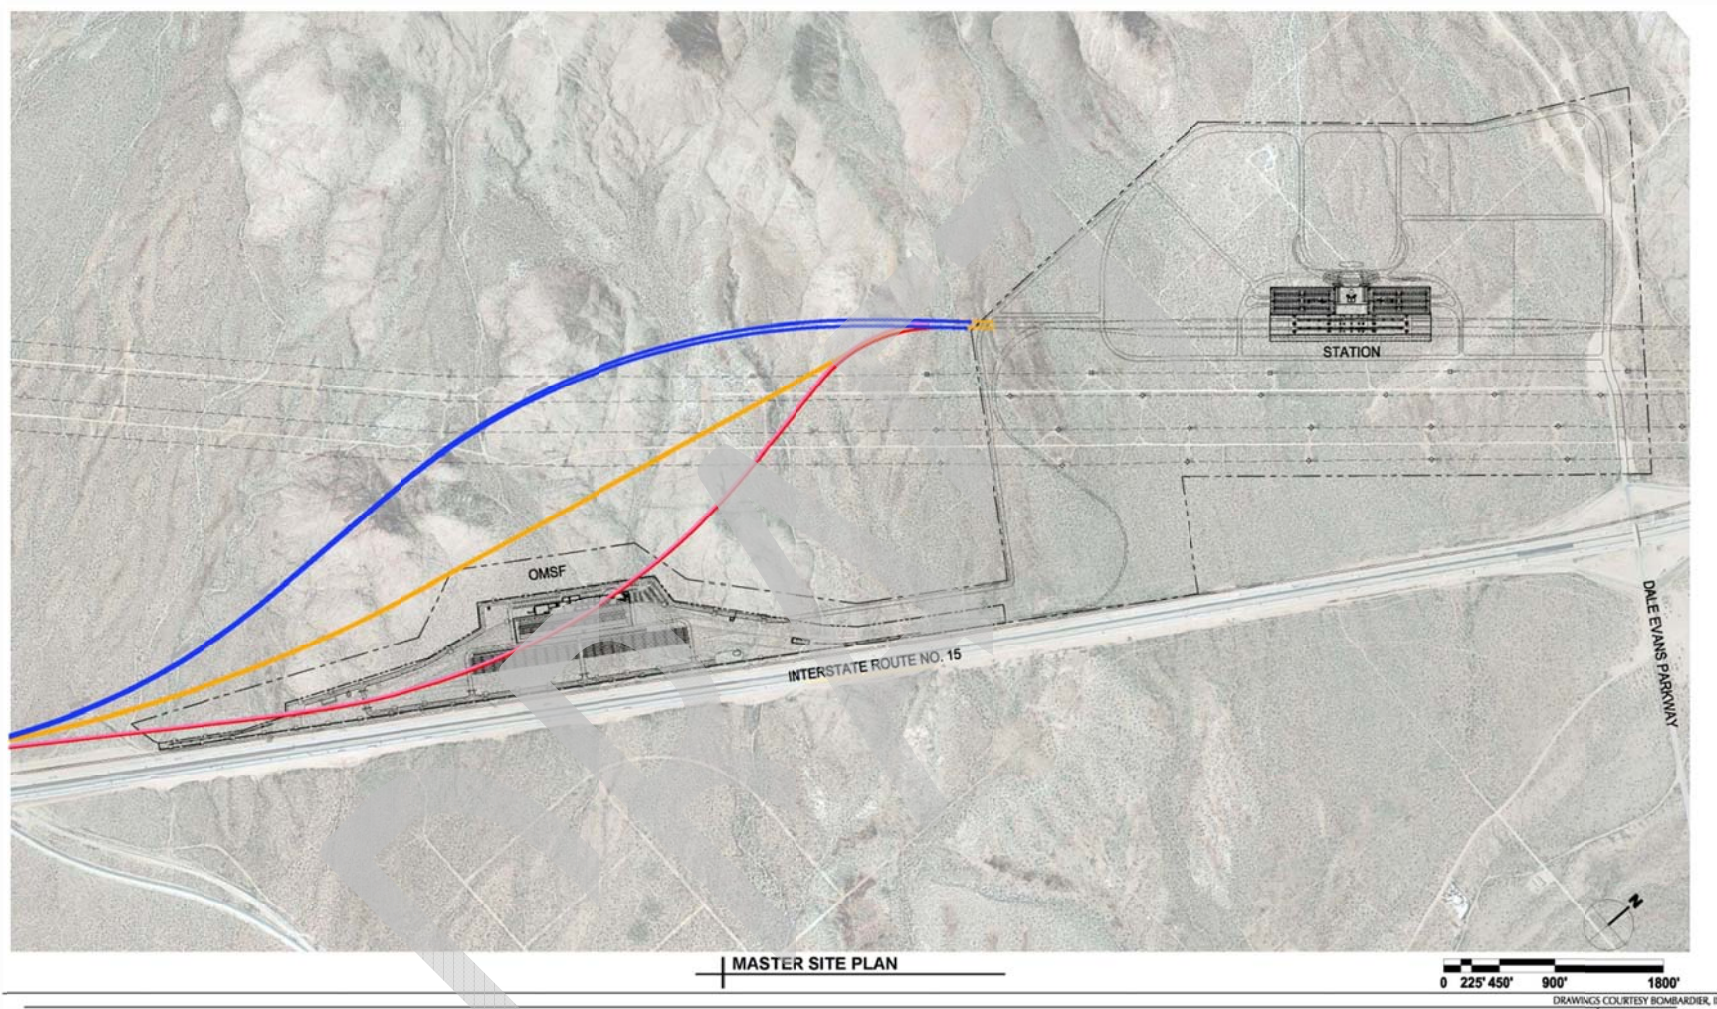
Planned Victorville XpressWest Station and OMSF with Potential HDC Rail Alignments
